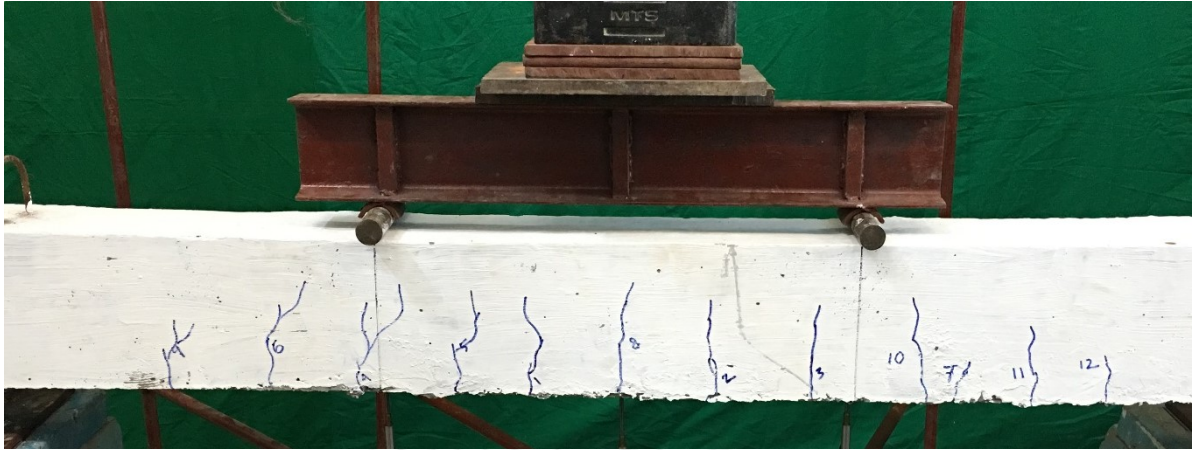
(a): Cracks in fully damaged RC beam, B9.
